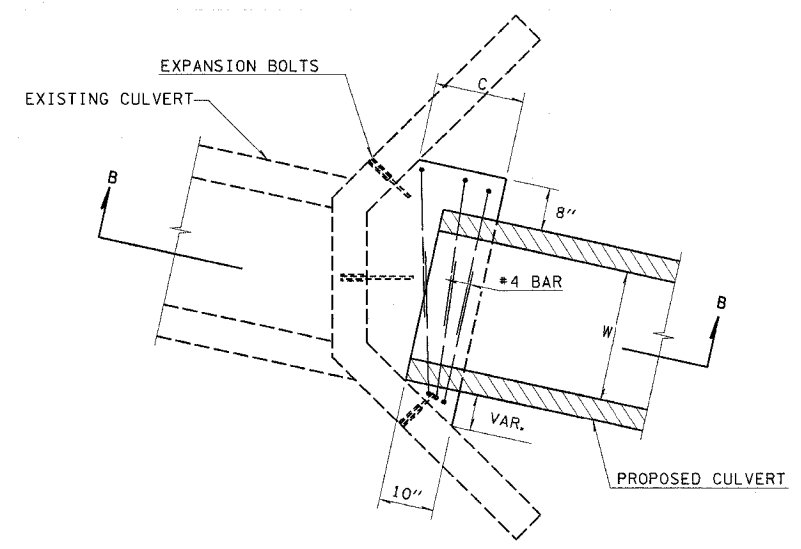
DETAIL OF CONCRETE COLLAR FOR BOX CULVERT EXTENSIONS
